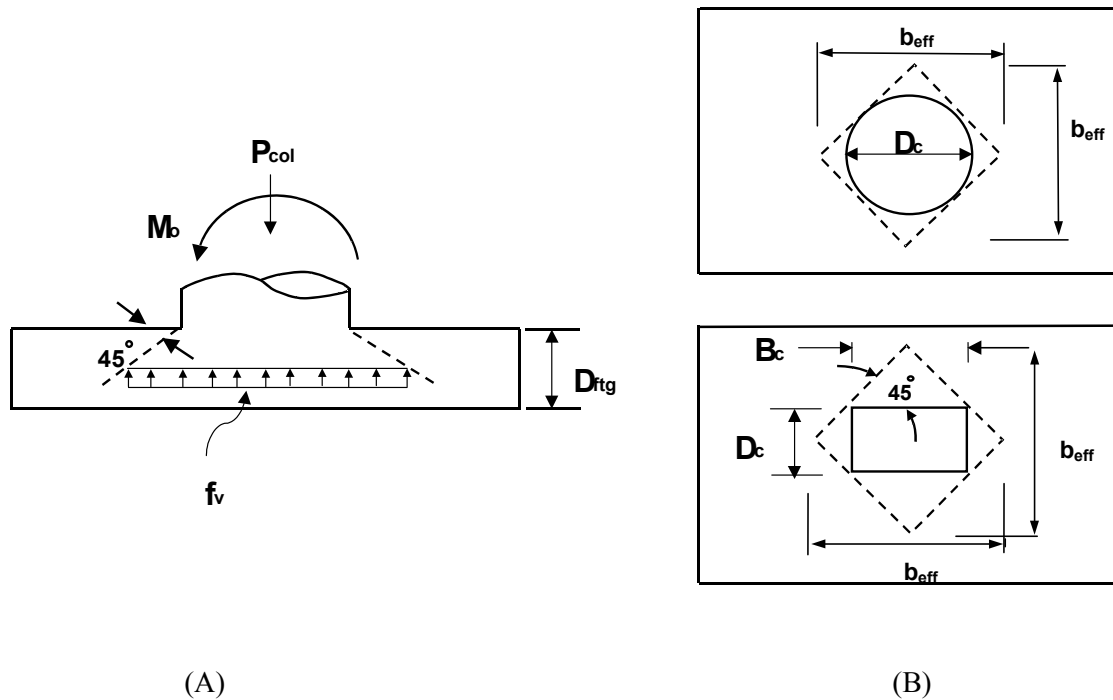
Assumed Effective Dimensions for Footing Joint Stress Calculation
